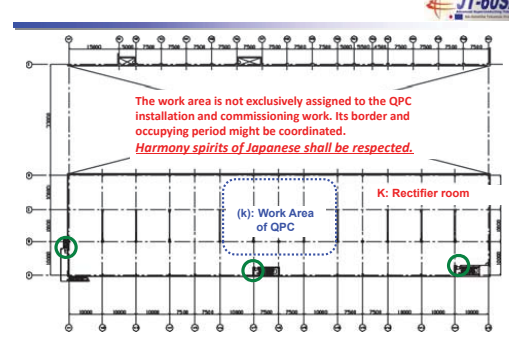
Second Floor of JT-60 Rectifier Building and Transformer Yard.
